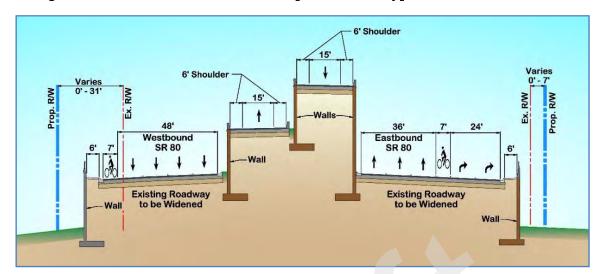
Build Alternative 4 - Proposed SR 80 Typical Section West of I-95
